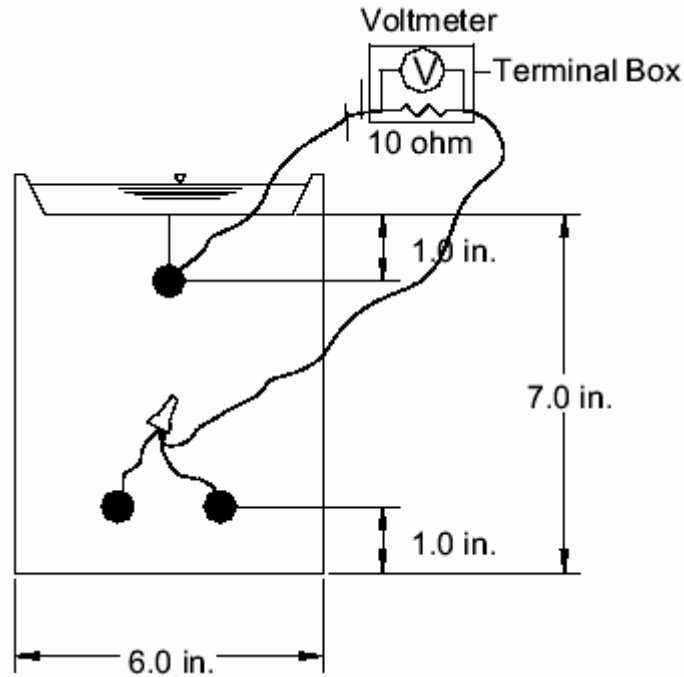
Test Setup for Cracked Beam Test (Darwin et al. 2002)
